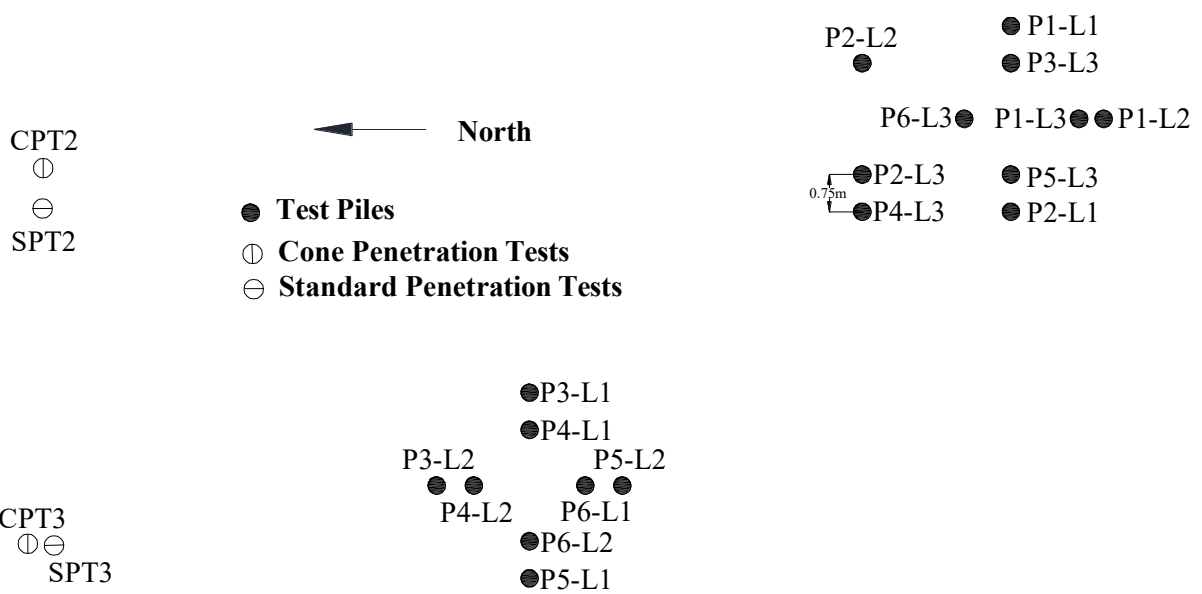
Site layout of the lateral load field tested piles, cone penetration tests and standard penetration tests at South Campus.
